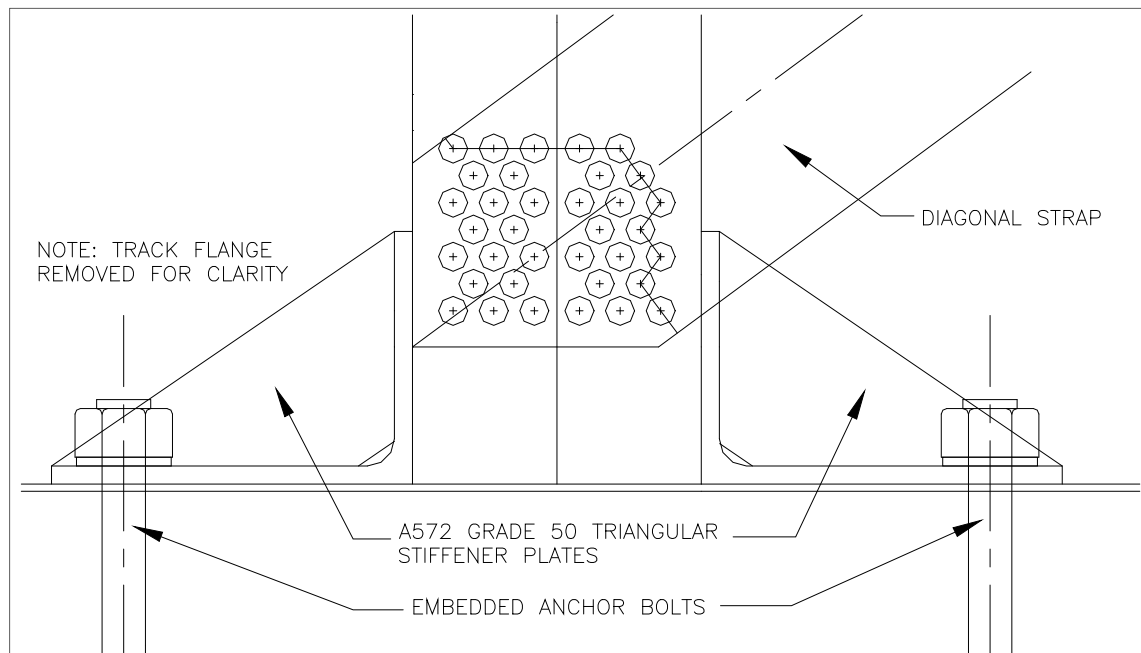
Example connection/anchorage detail—second row of Table 12-6 and Table 12-9 through 12-22.
